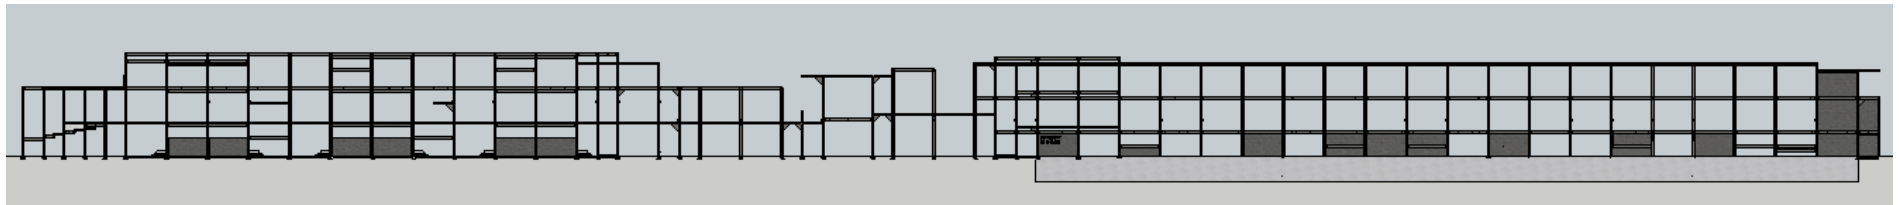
Elevation view of primary structure. *Figure not to scale.
